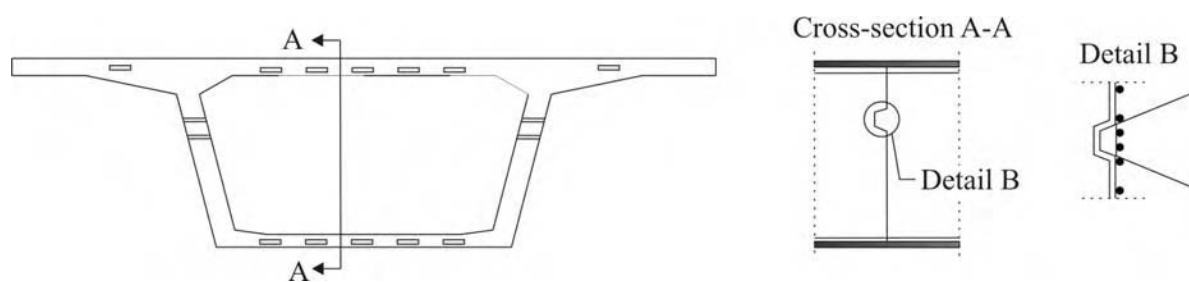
Segment joint with reinforced bracket [Ku2, Top]
